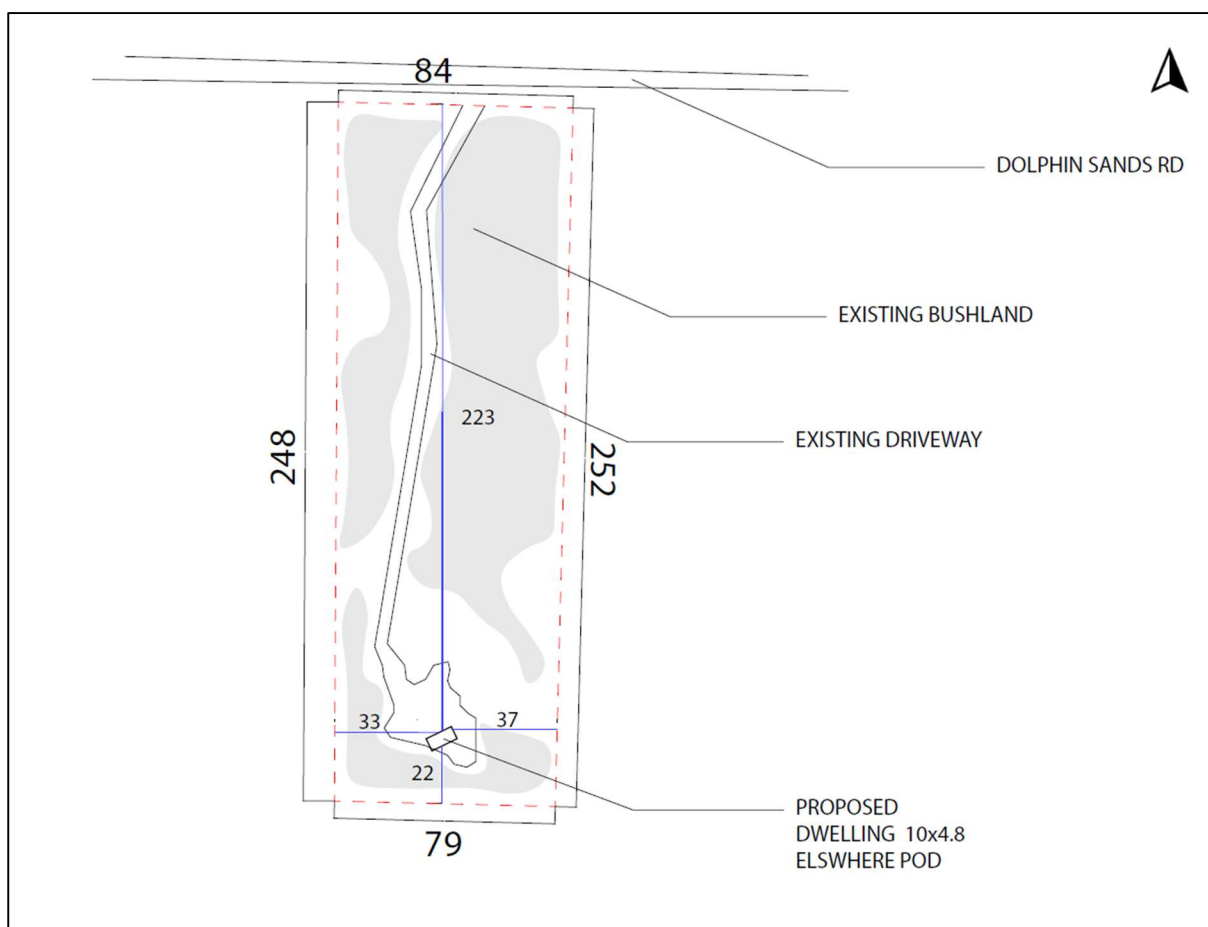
Proposed Site Plan (Source: Elsewhere Pods, 2025)
